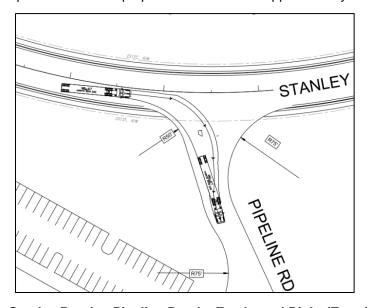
Stanley Road at Pipeline Road – Eastbound Right (Entering Truck)
